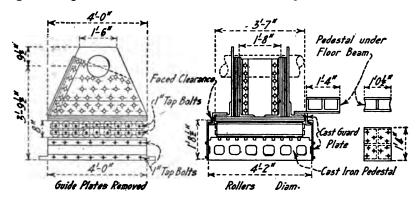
DETAILS OF A STEEL SHOE WITH SEGMENTAL ROLLERS.
